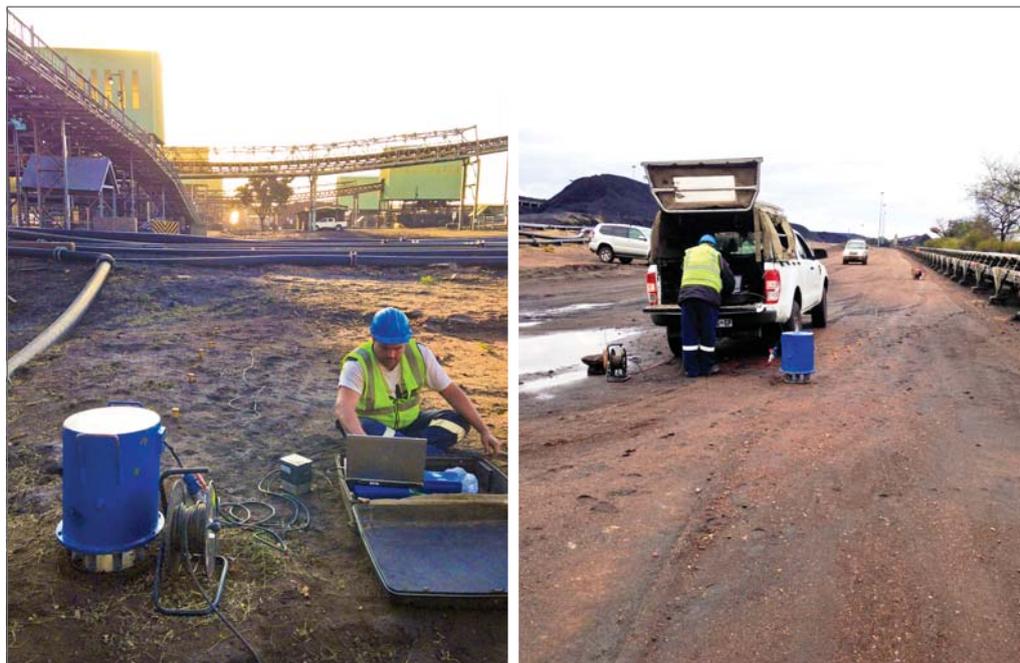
Testing along the proposed positions of the anaconda conveyor (left) and the new stacker rail beams (right)
